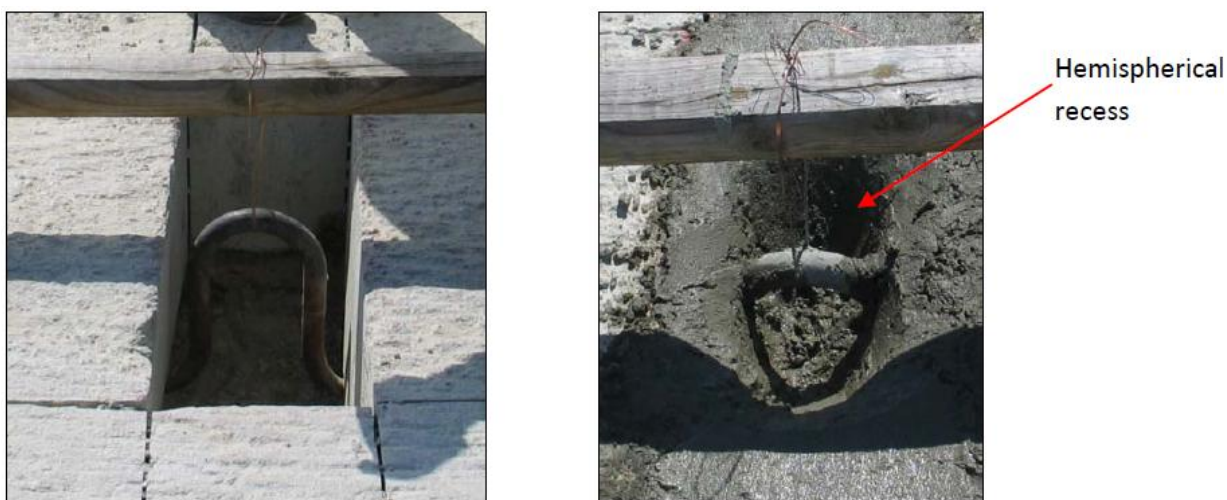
Hat Type Anchor- Pre and Post PCC Placement
